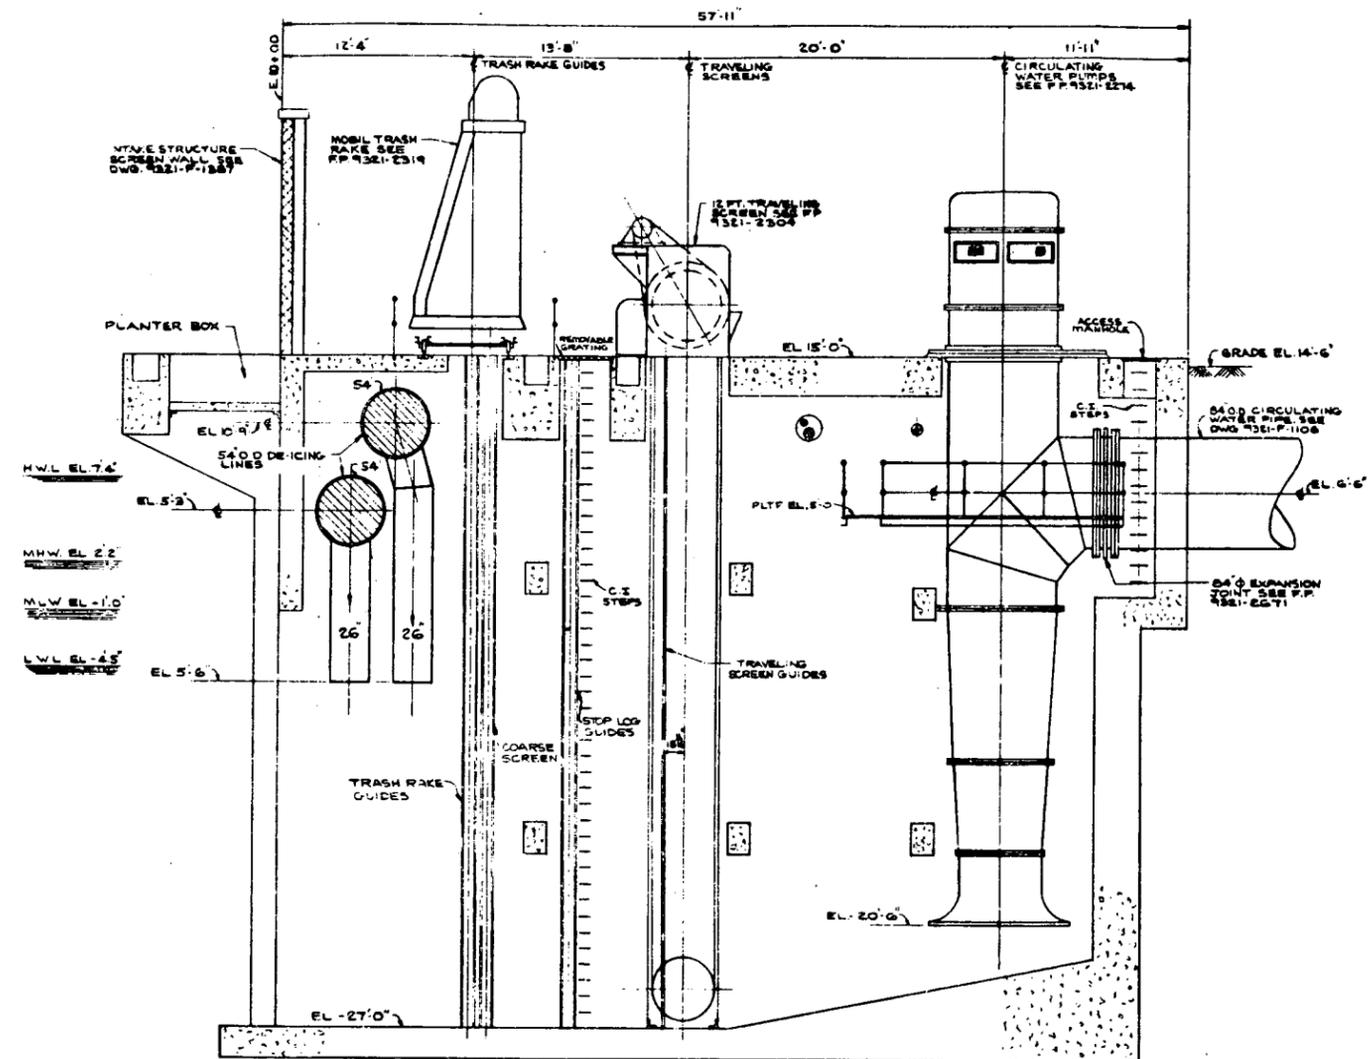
Unit No. 2 Intake Structure Plan Detail
